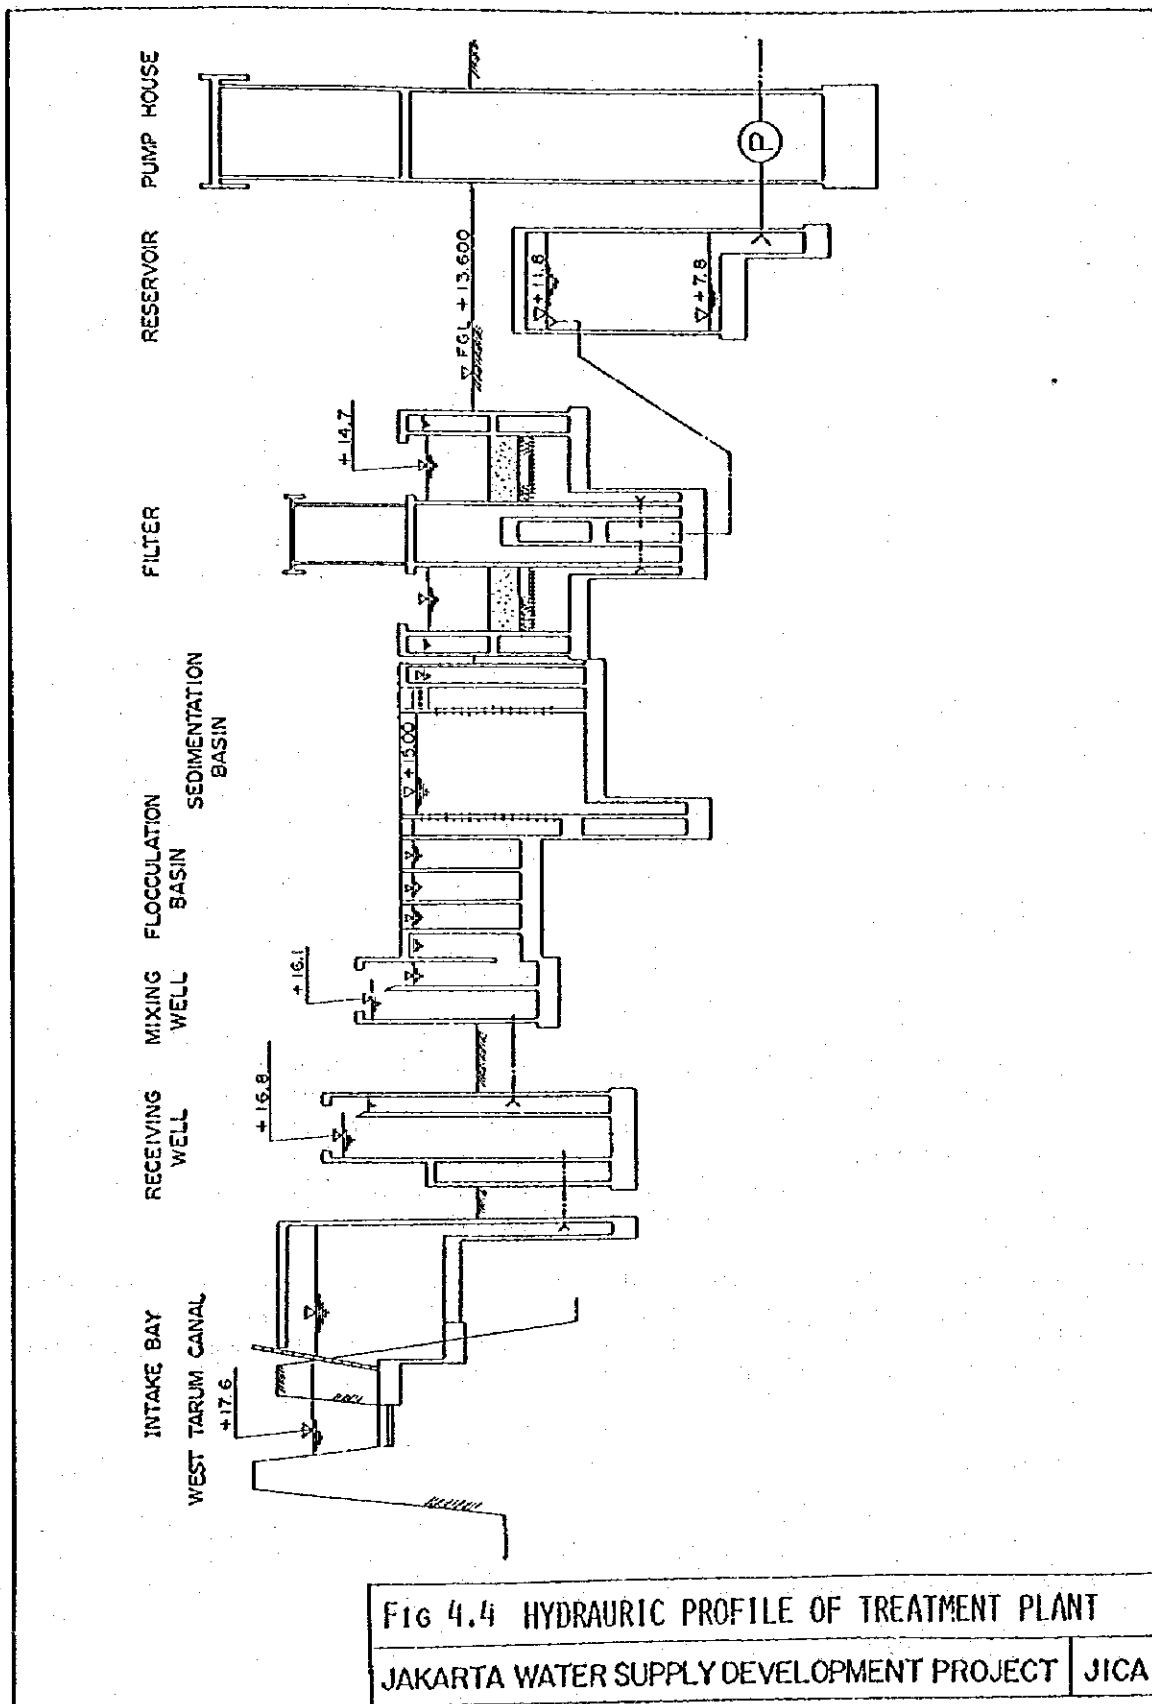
HYDRAULIC PROFILE OF TREATMENT PLANT
